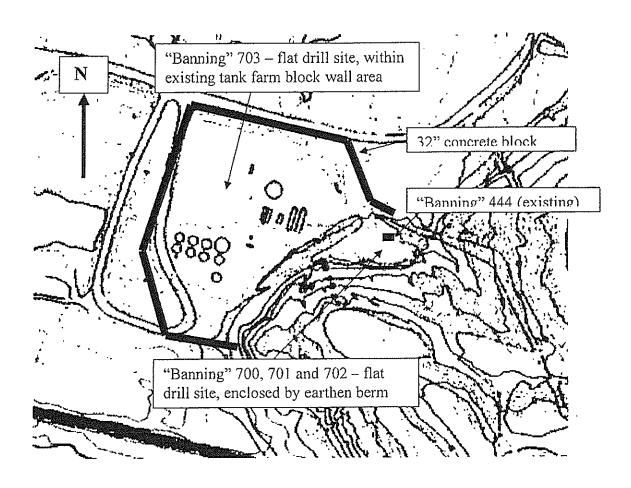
AERIAL PHOTO OF PROJECT SITE
